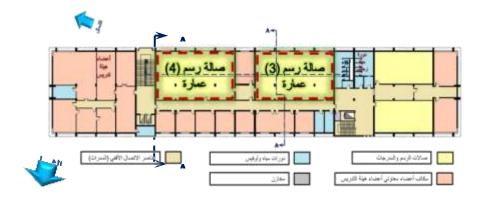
Horizontal skylight of 3th floor of the University. One drawing room are
